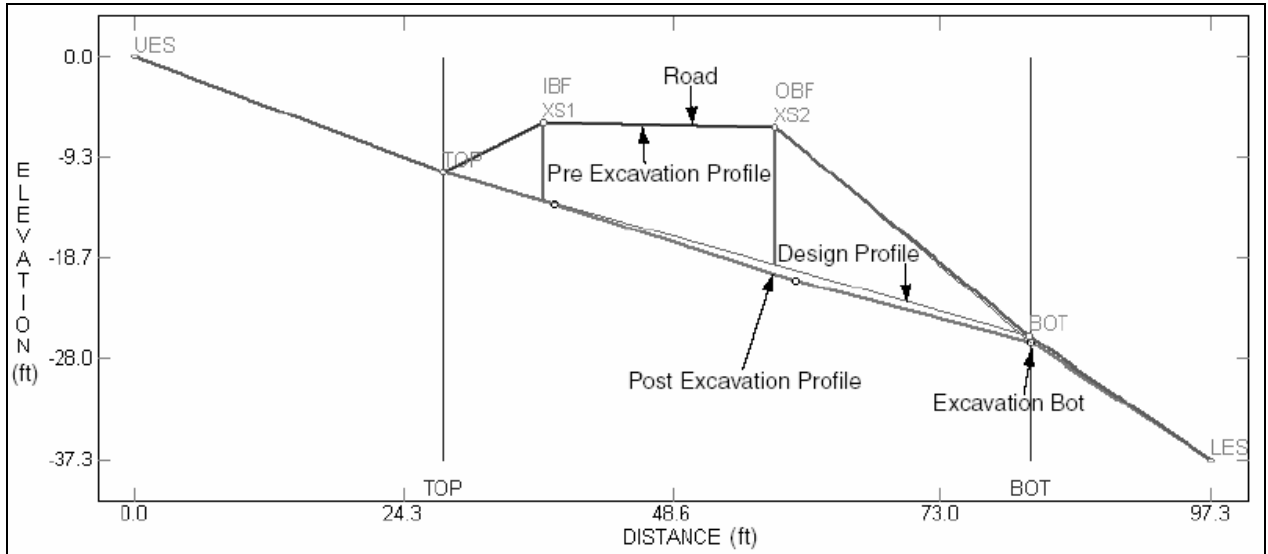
Redwood Creek 1305 Road Site #11 – Stream Crossing Pre & Post Excavation Profiles.
